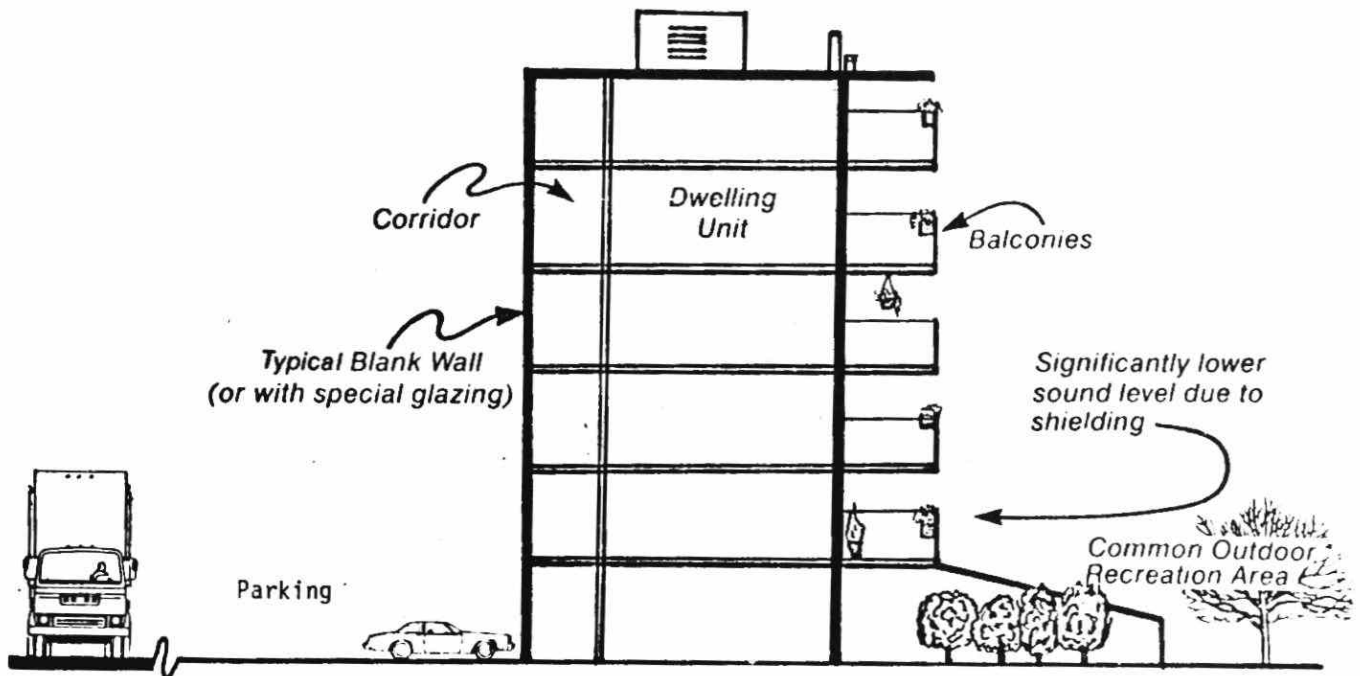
B.23.: The Use of Blank Walls for an Apartment Building or Stacked Townhouse
